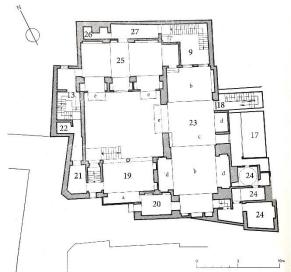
Zeinab Khatun's House - Ground Floor (Revault &Maury, 1979, 5).1- The
